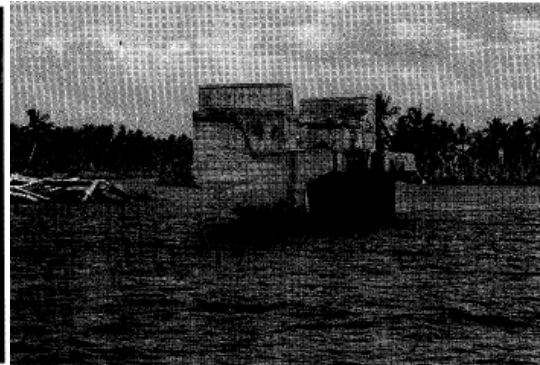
Bridge abutment of collapsed steel truss bridge in Kuala Bubon (Tobita T., et al. (2006))
